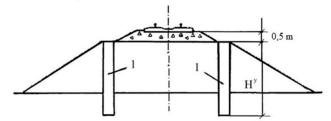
Diagram of earthwork stabilization at the bridge approach: 1 – columns of reinforced soil
